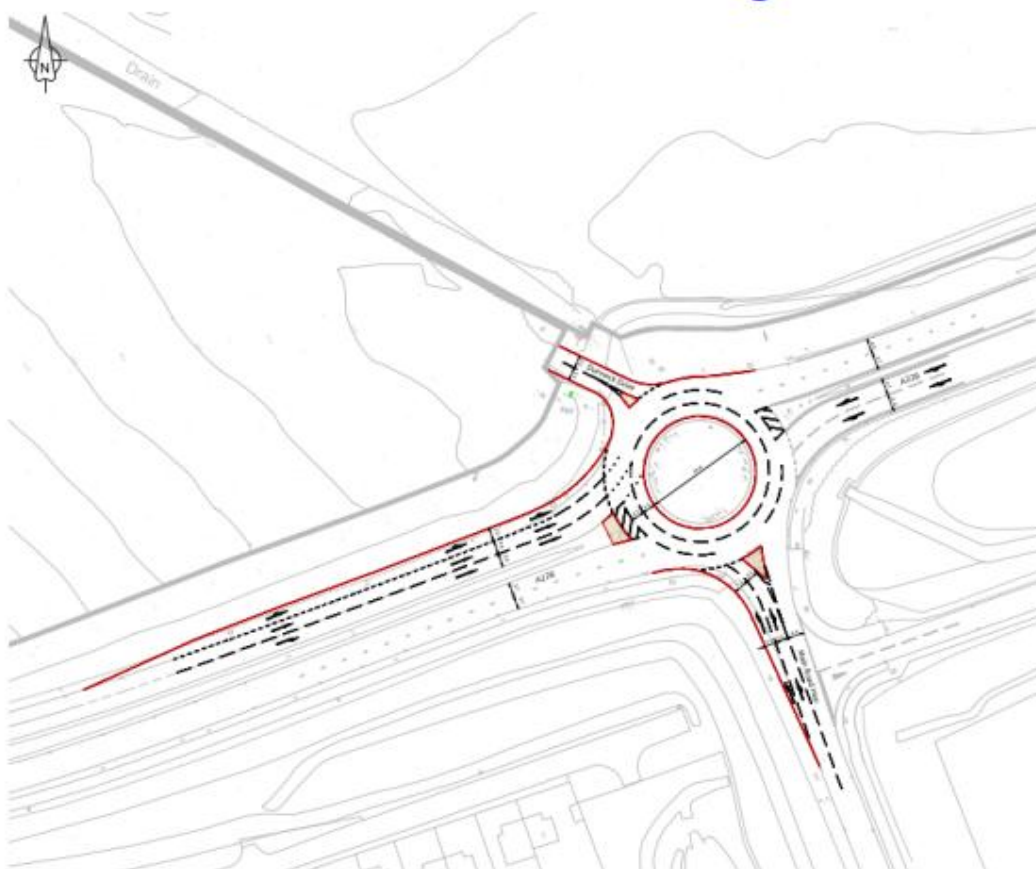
Proposed Jacobs Interim Layout – A228 Peninsula Way / Main Road Hoo
